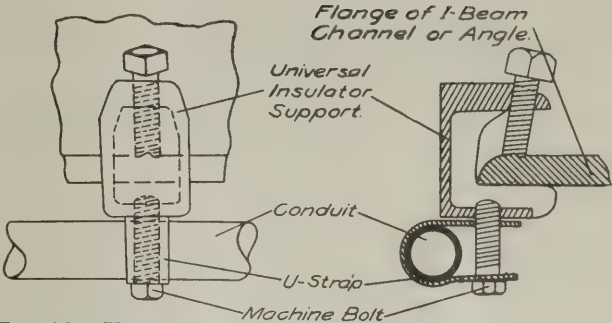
UNIVERSAL INSULATOR SUPPORT USED TO CLAMP CONDUIT TO I-BEAM CHANNEL OR ANGLE.
